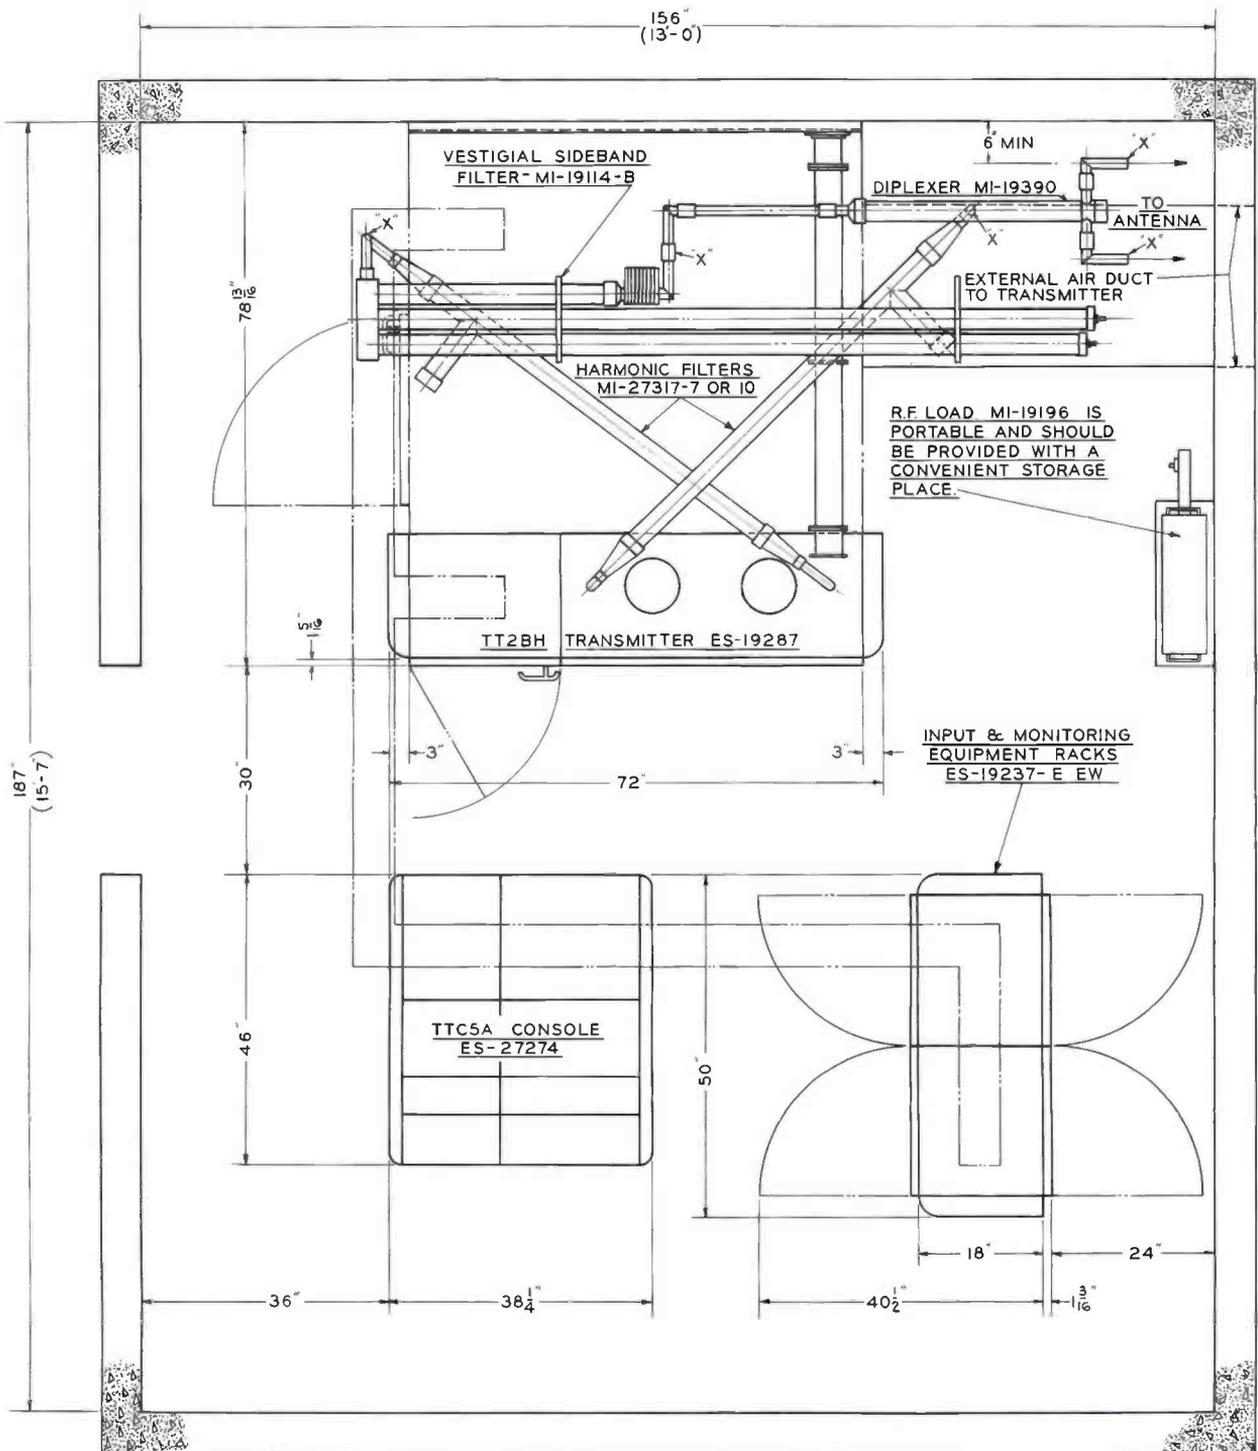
Typical floor plan arrangement for the TT-2BH. The entire transmitter is only 72 inches wide and can be located in a small floor area. At points marked by "X," provisions should be made for connection of a dummy load for testing and tuning the TT-2BH.
